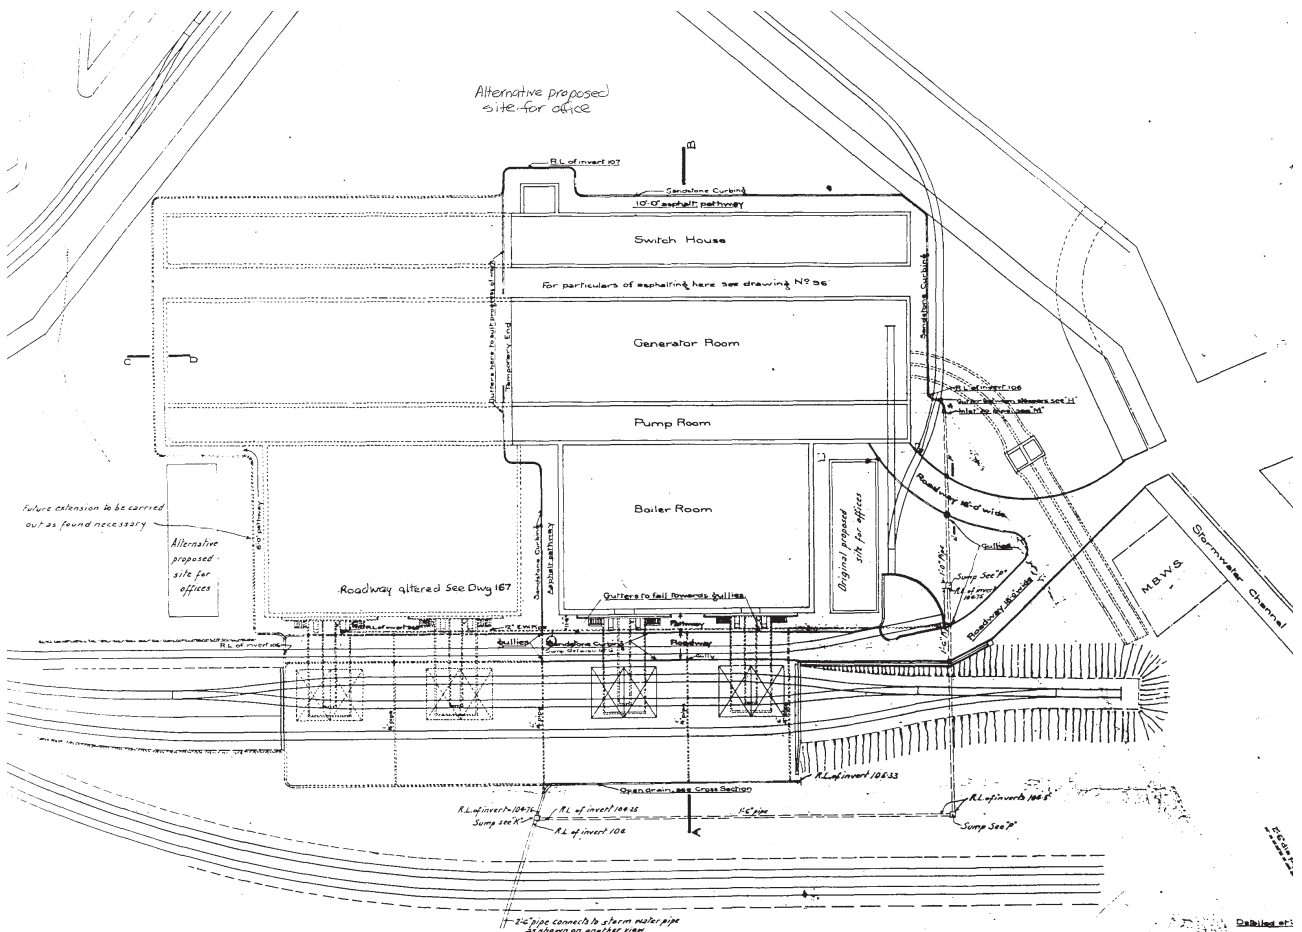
White Bay Power Station Building Extension Outline Arrangement, 1914 (courtesy of Placemaking NSW, WB9061).
